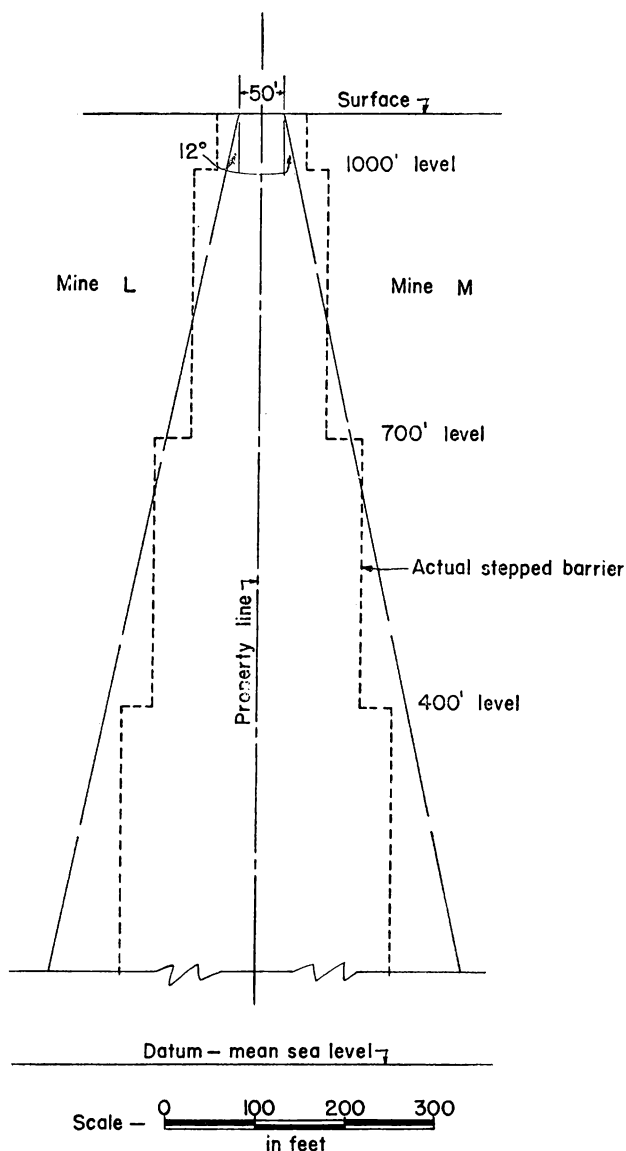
Cross section of a barrier designed to act as a dam superimposed on an actual stepped barrier.
